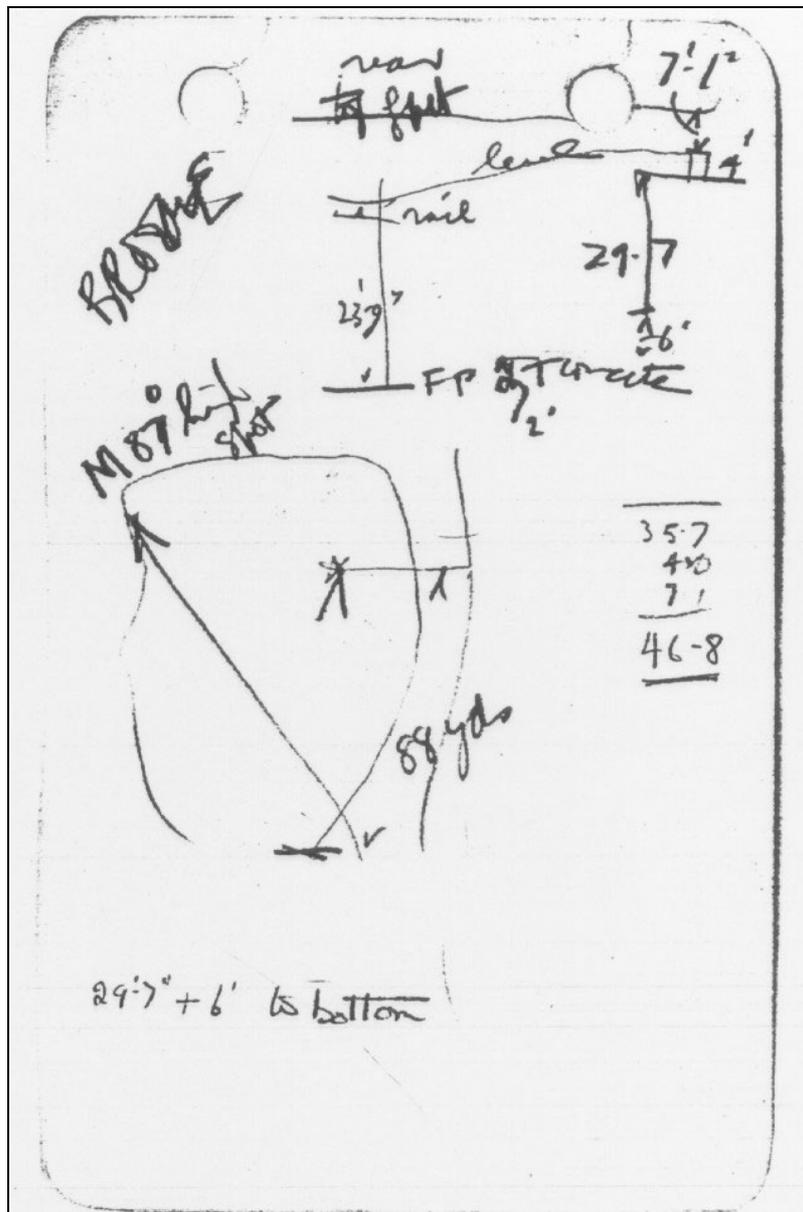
sketch plan and levels of Pratt's Old Pit, Broom by C.E. Bean (April/May 1938)
